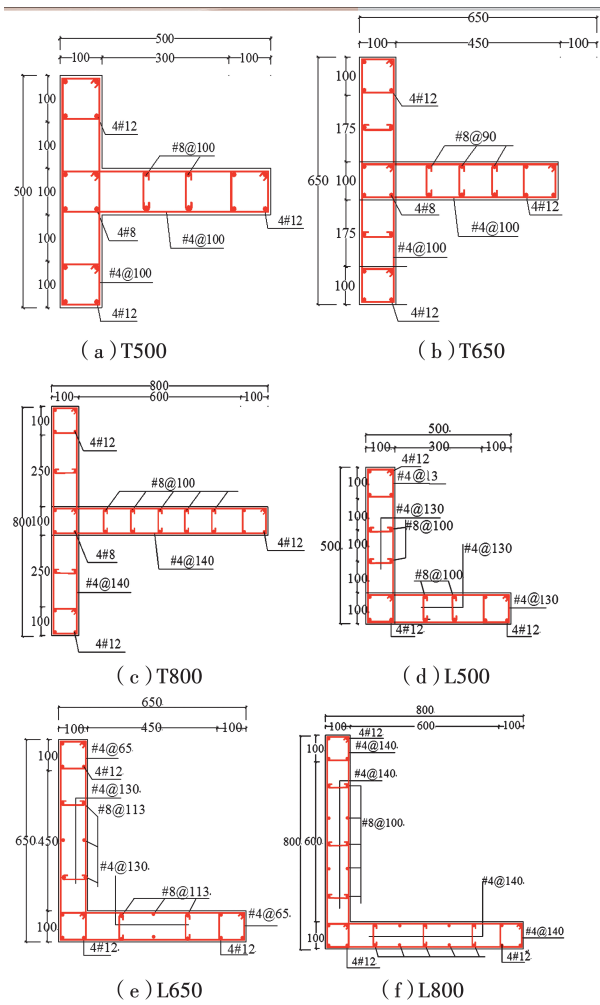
Dimensions and reinforcement details of RC shear wall specimens (mm)
